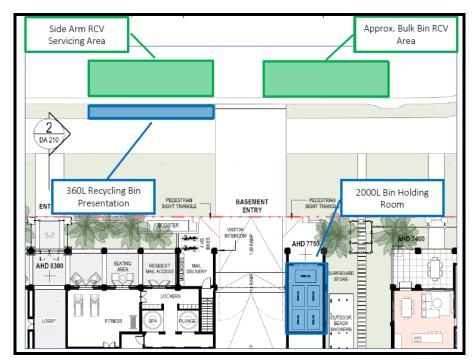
Proposed Waste Collection Arrangements (Source: Waste Plan, TTM, August 2023)
